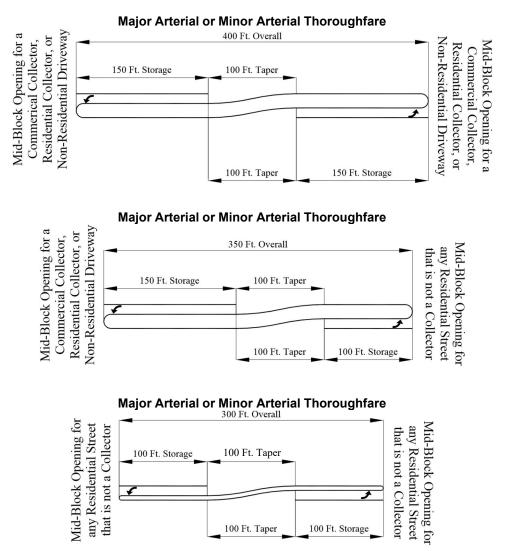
Minimum Distance between Mid-Block Median Openings on a Major Arterial or Minor Arterial Thoroughfare
